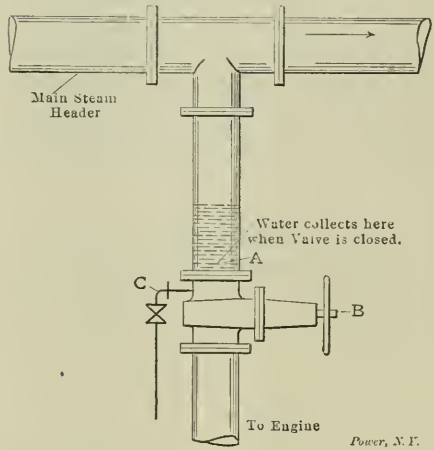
WHEN STEAM IS TAKEN FROM BOTTOM OF HEADER
